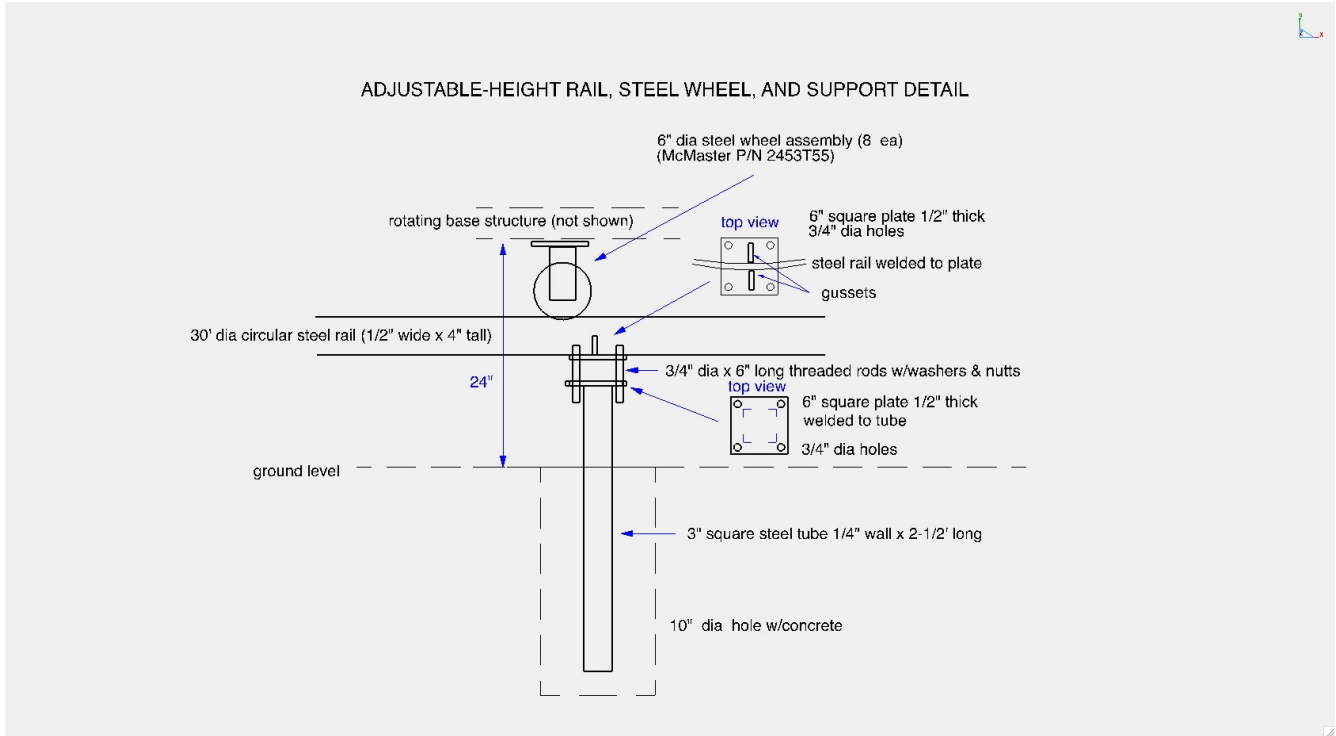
Details of the design of the adjustable-height rail support system (9FEB2023).
